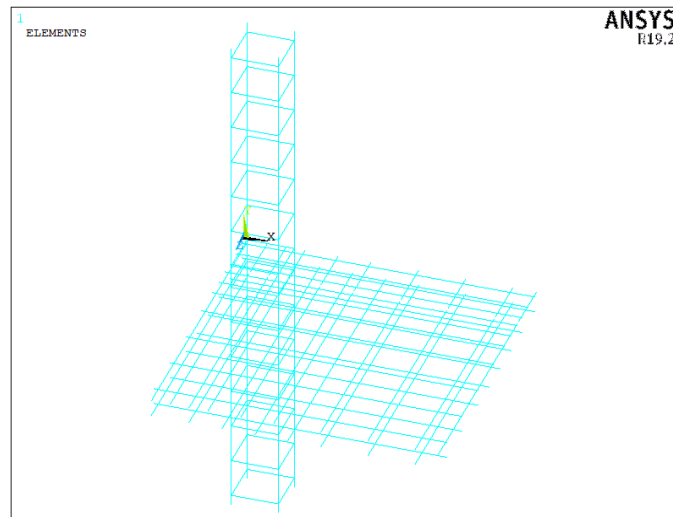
The layout of reinforcement of the control slab specimen (Sectional elevation view)
